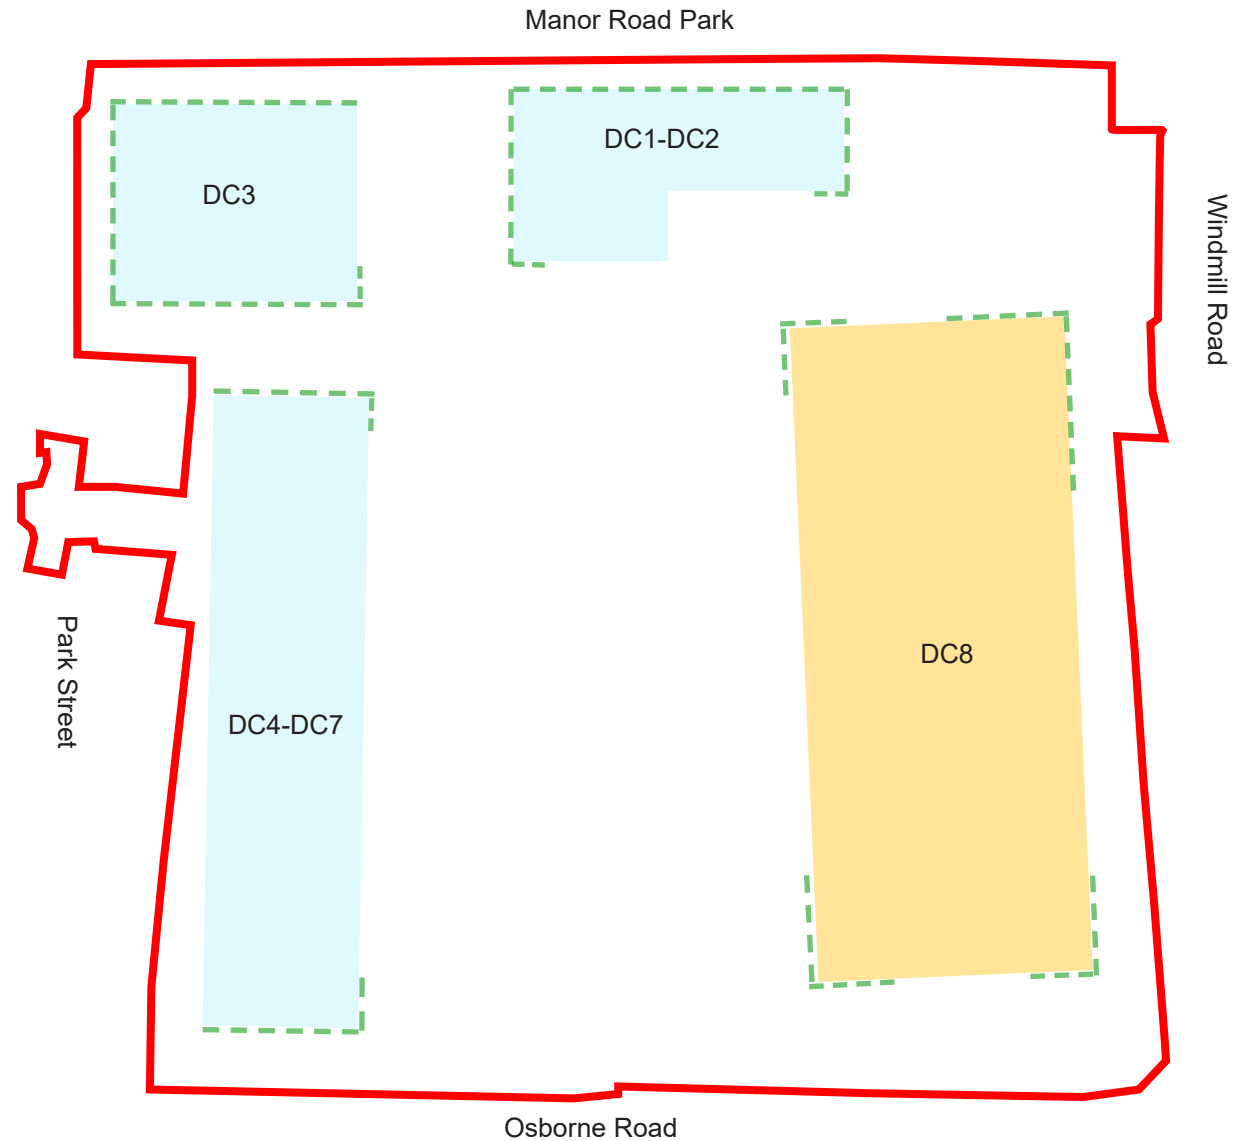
PRIMARY ELEVATIONS INDICATED ON SITE PLAN
